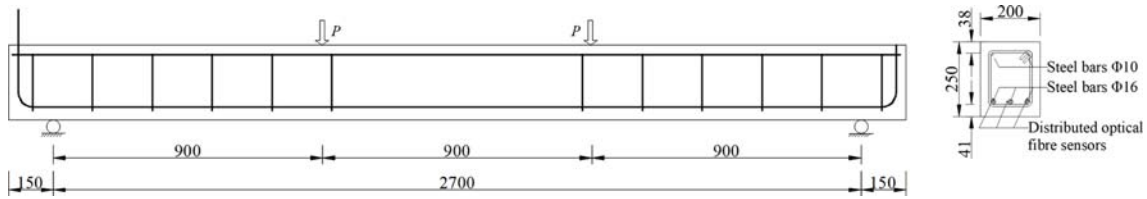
Layout of the Beam Specimen Redrawn from the Literature (Berrocal et al., 2021) (unit: mm)
